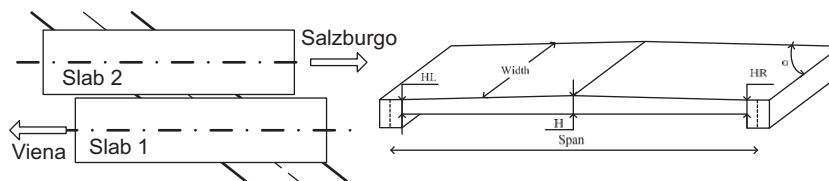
Plan view of the viaducts: twin slabs and structural layout.
